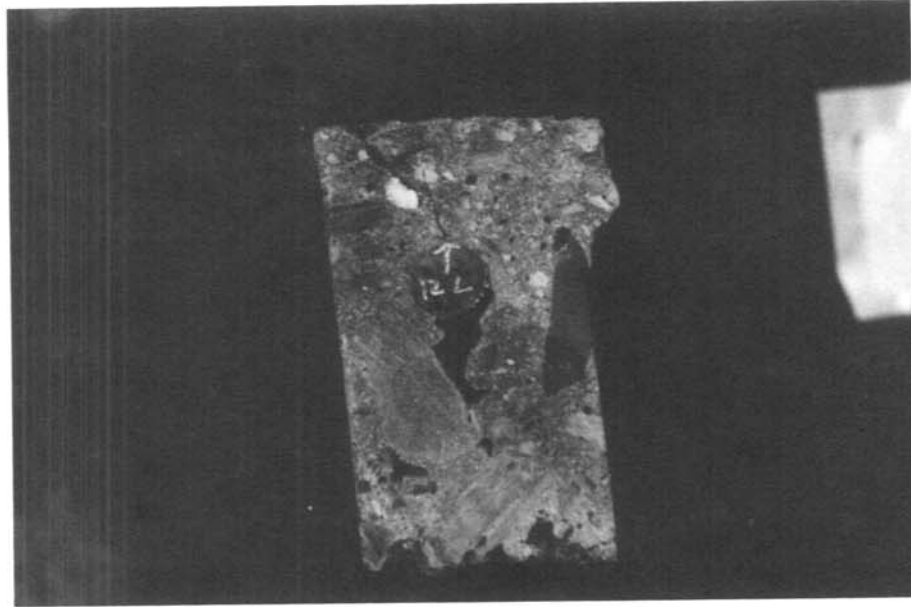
Edge view of Sample No. 12 showing longitudinal No. 4 (1/2-inch diameter) reinforcement. Note large void beneath the steel and crack from the surface of the concrete to the steel.
